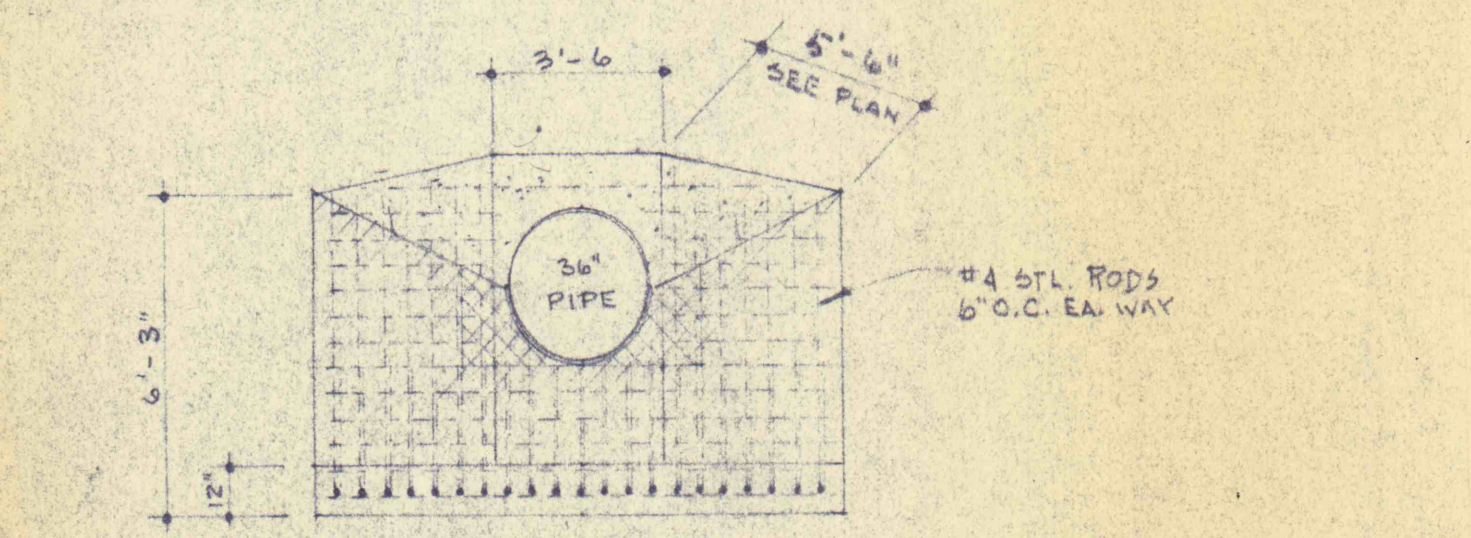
DETAIL OF EXISTING CULVERT ON ROUTE #901 (DITCH-A) - (I)
